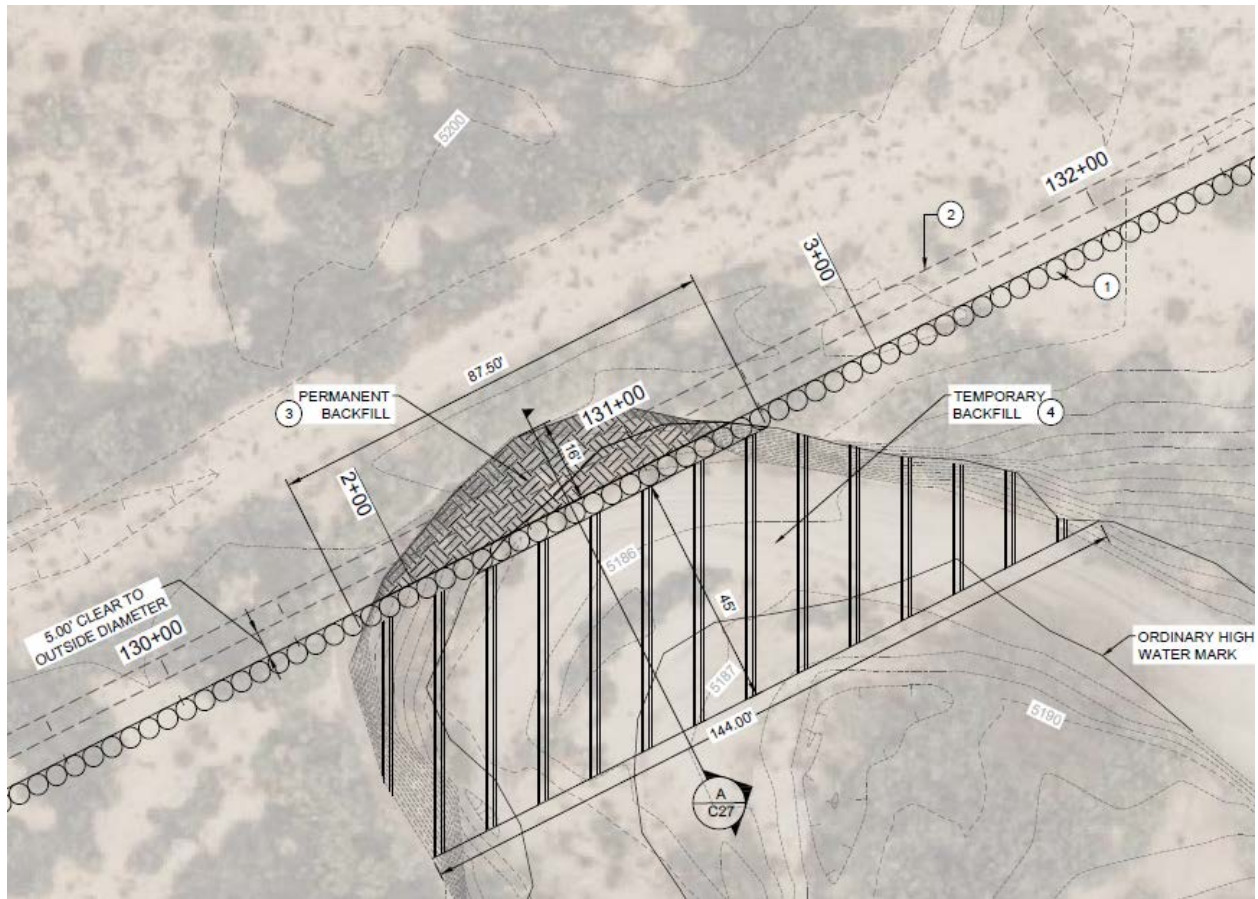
Concrete pile tangent wall design exhibit indicating the permanent and temporary backfill locations.
